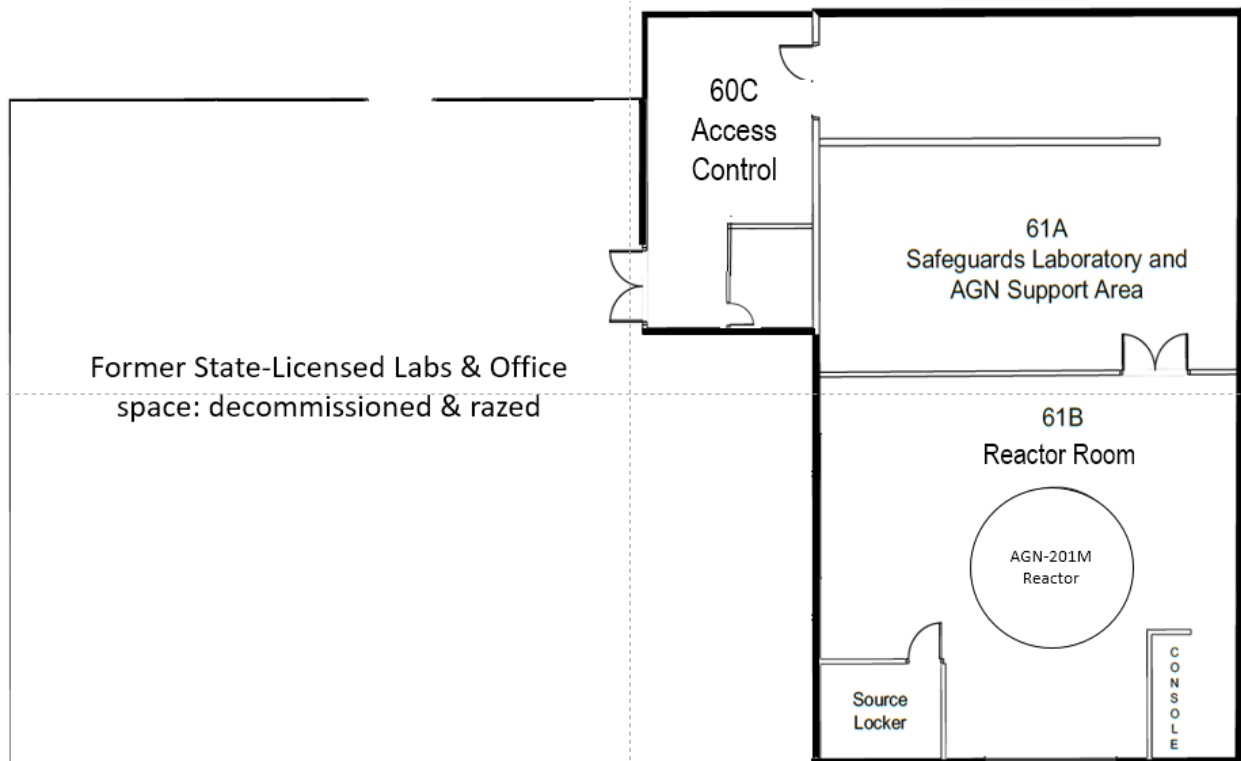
Ground Floor Layout. (Main 61 Area Rooms: ~27 ft by ~48 ft)
